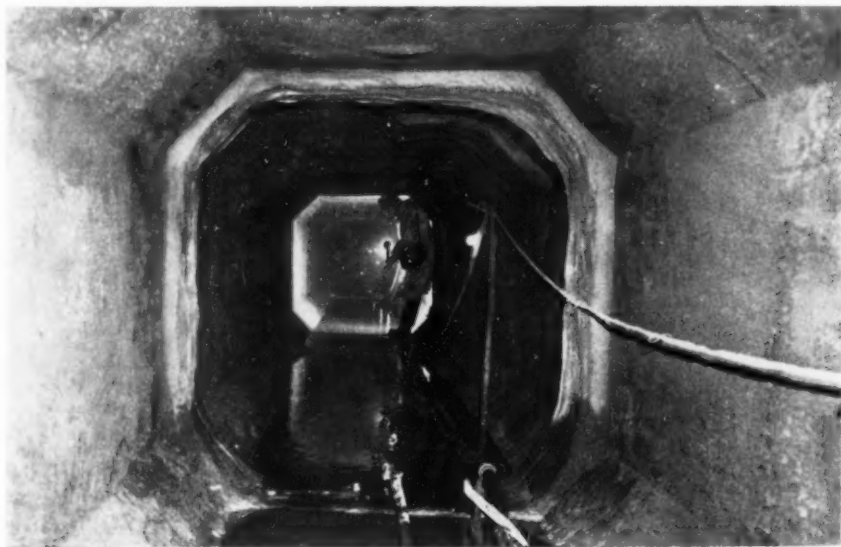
Completed Expansion Joints and Patches in North Conduit
